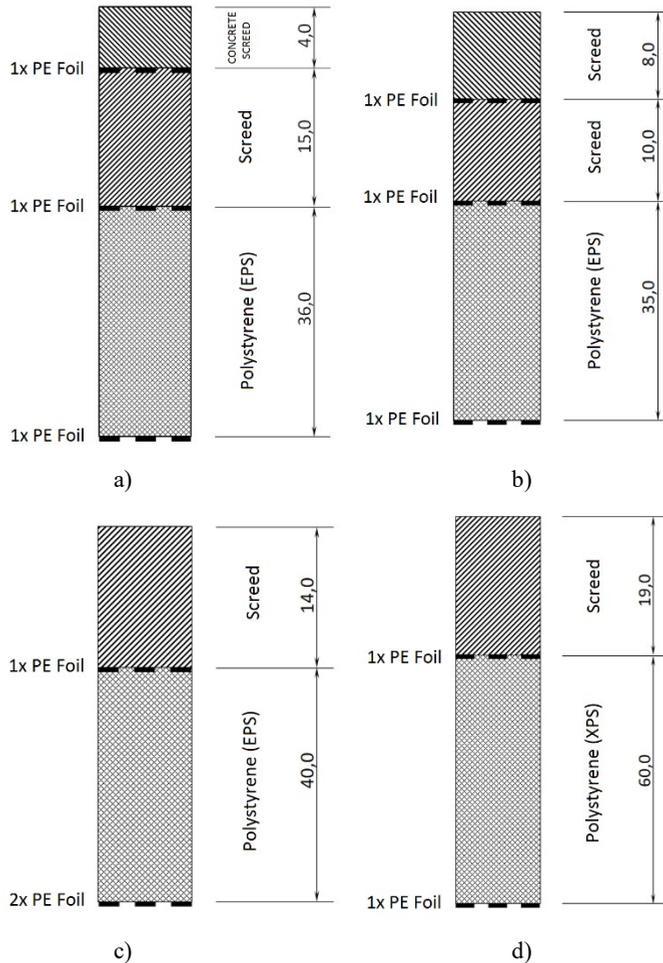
The layout of the floor layers above the railway tunnel in randomly selected places: a), b) in the rooms of tenants and c), d) in generally open corridors (the drawings do not indicate the construction of the floor slab).
